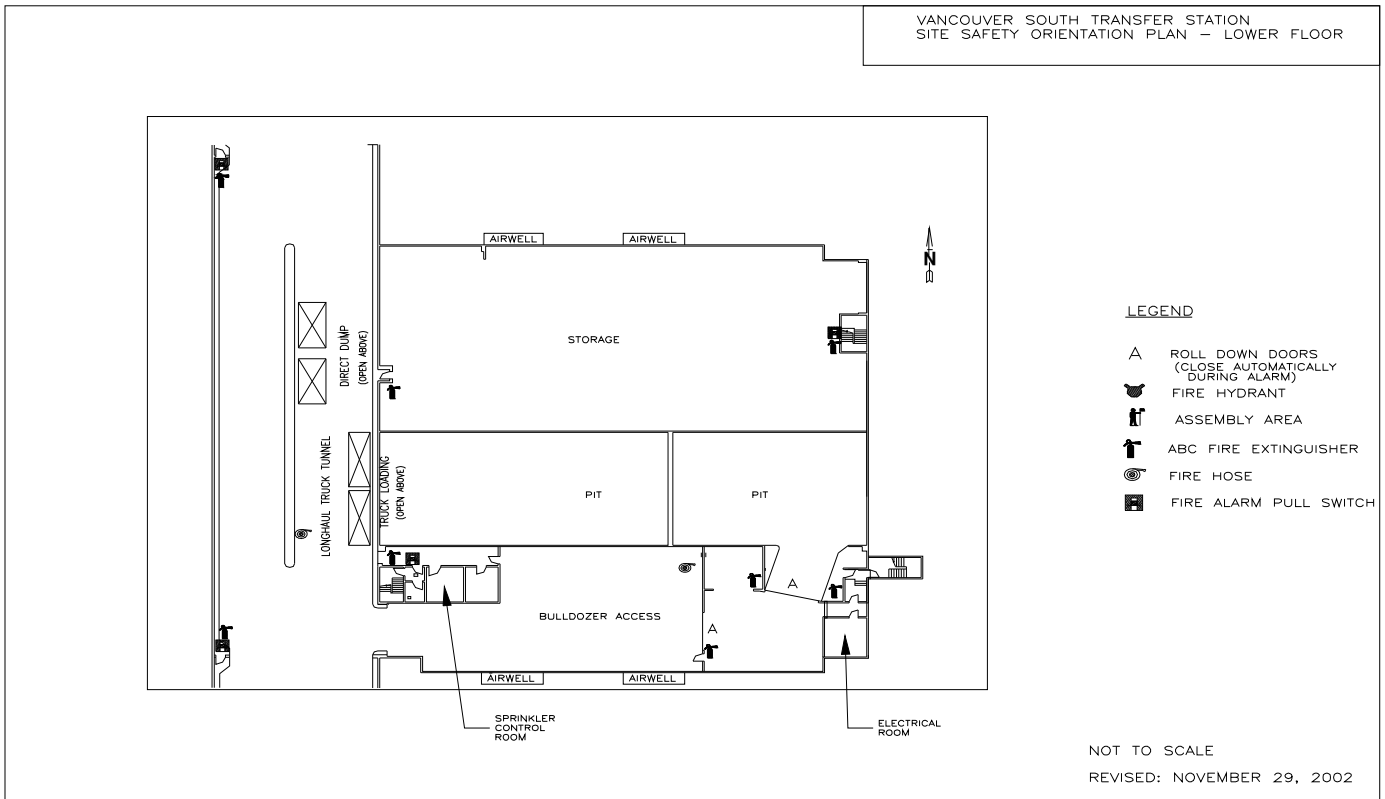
Vancouver South Transfer Station, Lower Floor, Plan View
